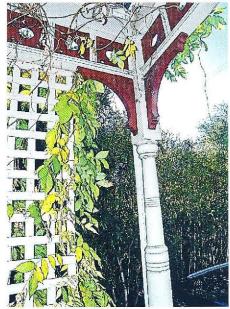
3378 View: Side porch column top & brackets, frieze, lattice & wisteria: Photo Date: December, 2023; Camera Facing: S
